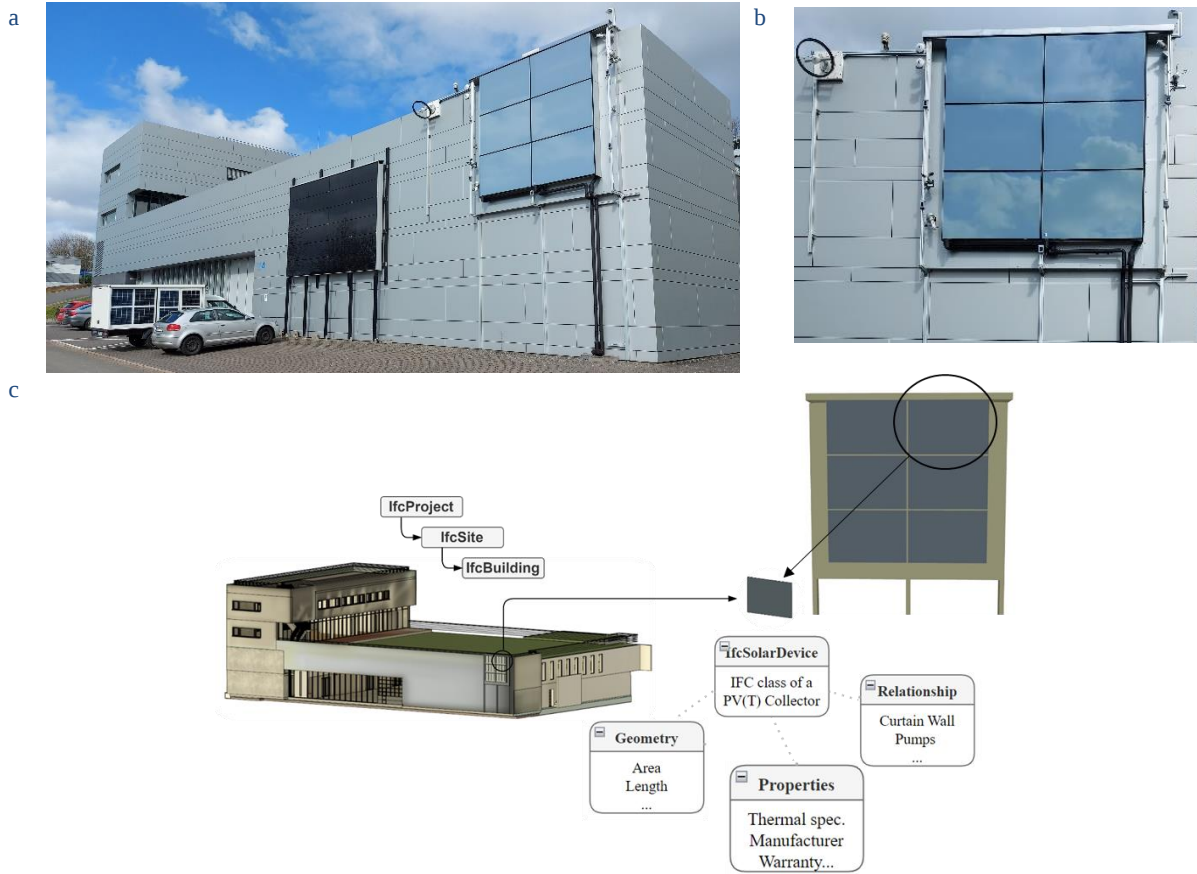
BIM model (digital twin) of the building with the PVT façade at ISFH, a: real building, b: PVT façade, c: BIM model of the building and the PVT façade with schematic explanation of the IFC structure of the PVT façade
